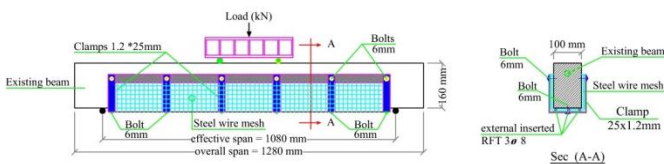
c] External additional horizontal steel bars 3Ø8 with 6 vertical steel clamps distributed uniformly.
